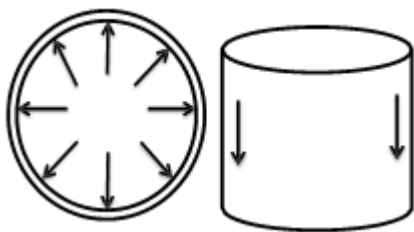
Plan of silo showing horizontal pressure acting on the silo wall and
